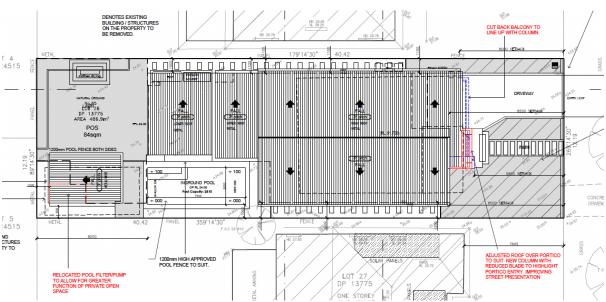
Proposed site plan - No. 65 Kelvin Parade Picnic Point 2213
